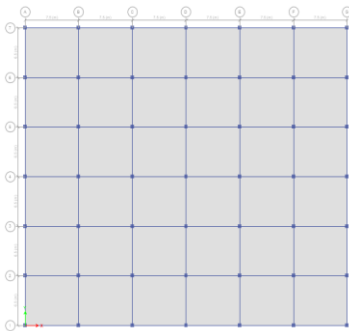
Plan showing the bare frame model, it's a building without shear wall.
